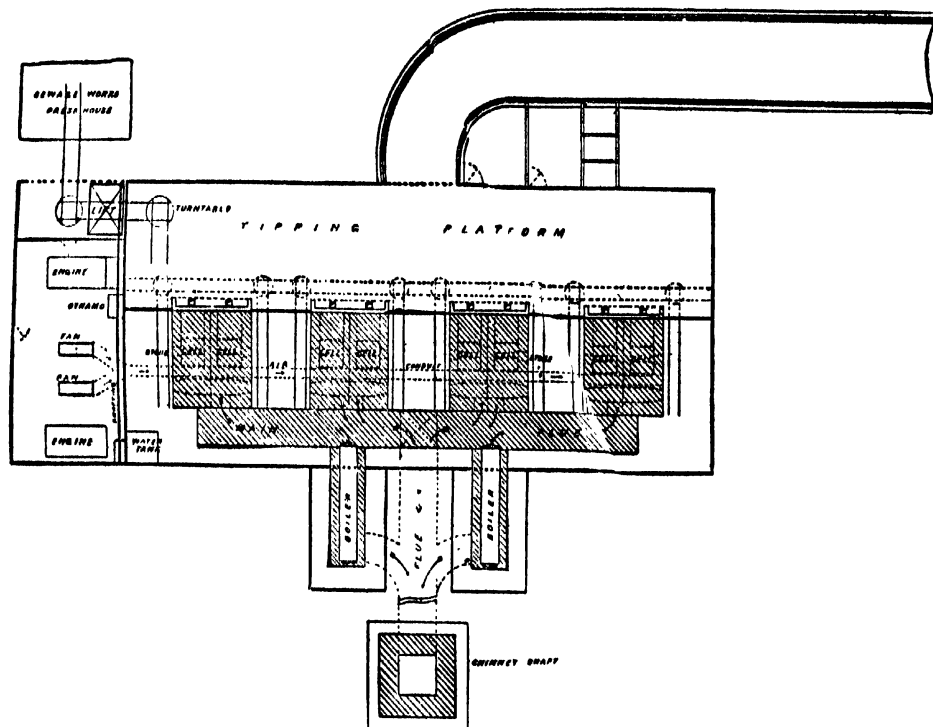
Leyton Destructor. Block Plan, showing general arrangement of the Works.
